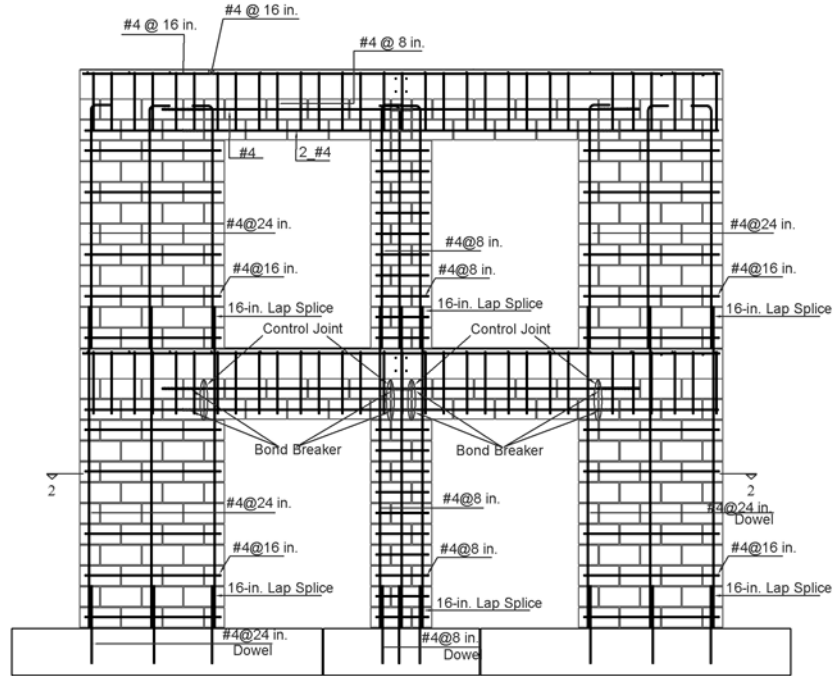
Steel Reinforced Details of Flange Walls. Mavros, M. 2013. Personal Communication. Used under fair use, 2014.
